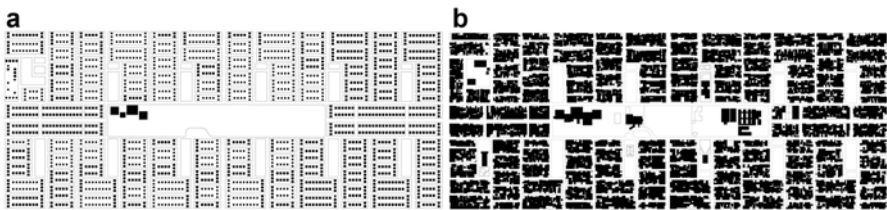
(a) Original plan, 1966, (b) actual plan, 2014, developed by authors
